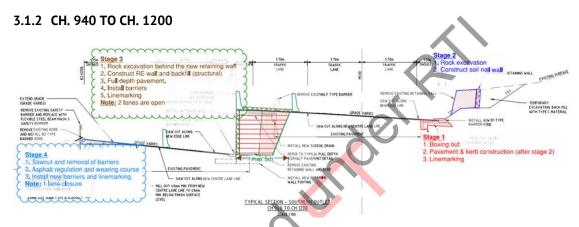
Typical section - Southern Outlet Ch. 940 to Ch. 1200
